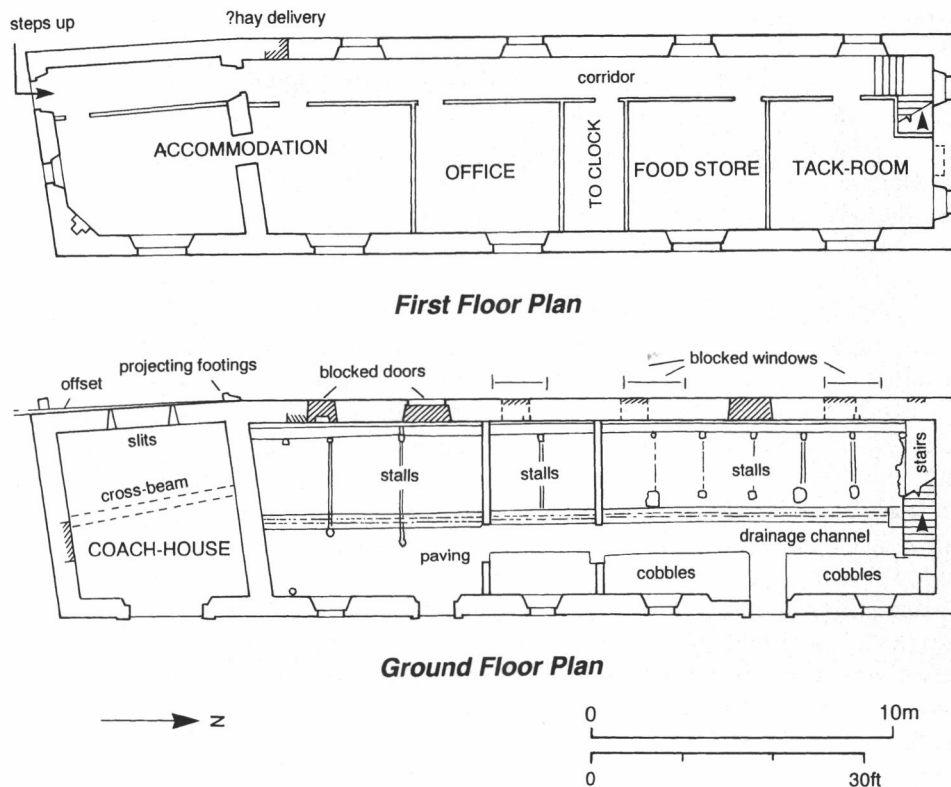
Tissington Hall: ground-floor and first-floor plans. Scale 1:250. Drawn by R. Sheppard.
